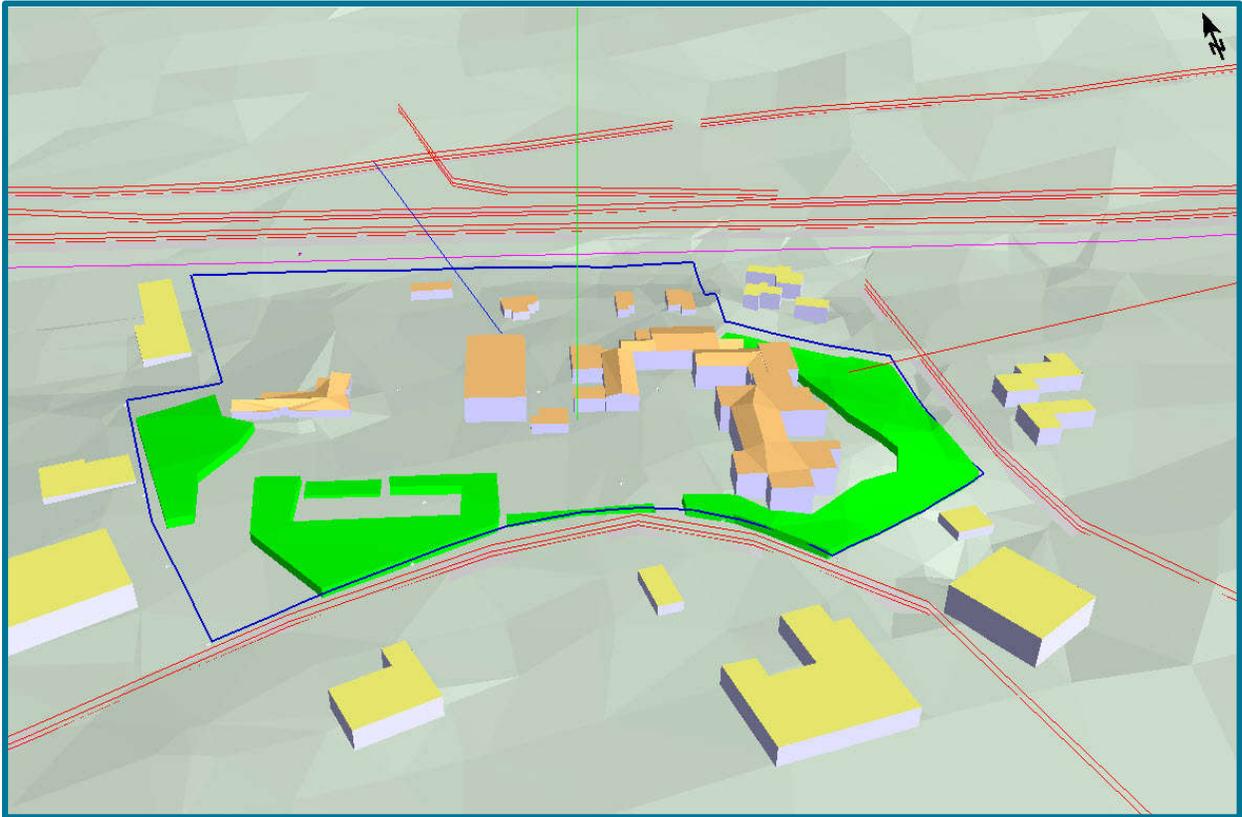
Music Academy of the West Site Plan with Outdoor Zones
